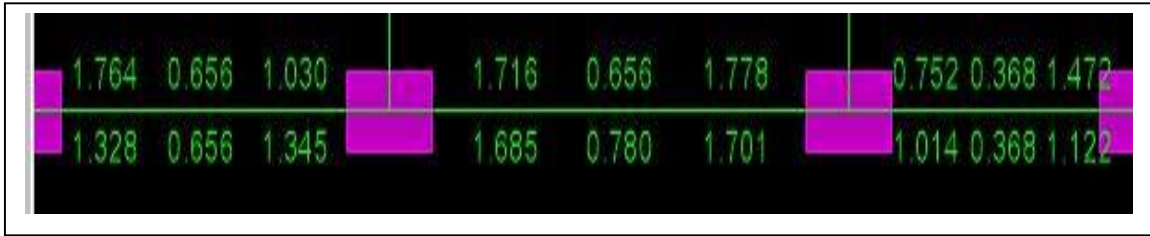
Steel Area of 3rd Floor Beam Y-axis
